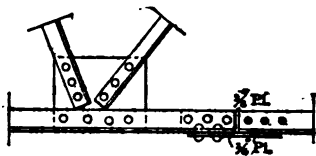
Detail of Joint E and Splice in EH, Fink Truss, Fig. 7
